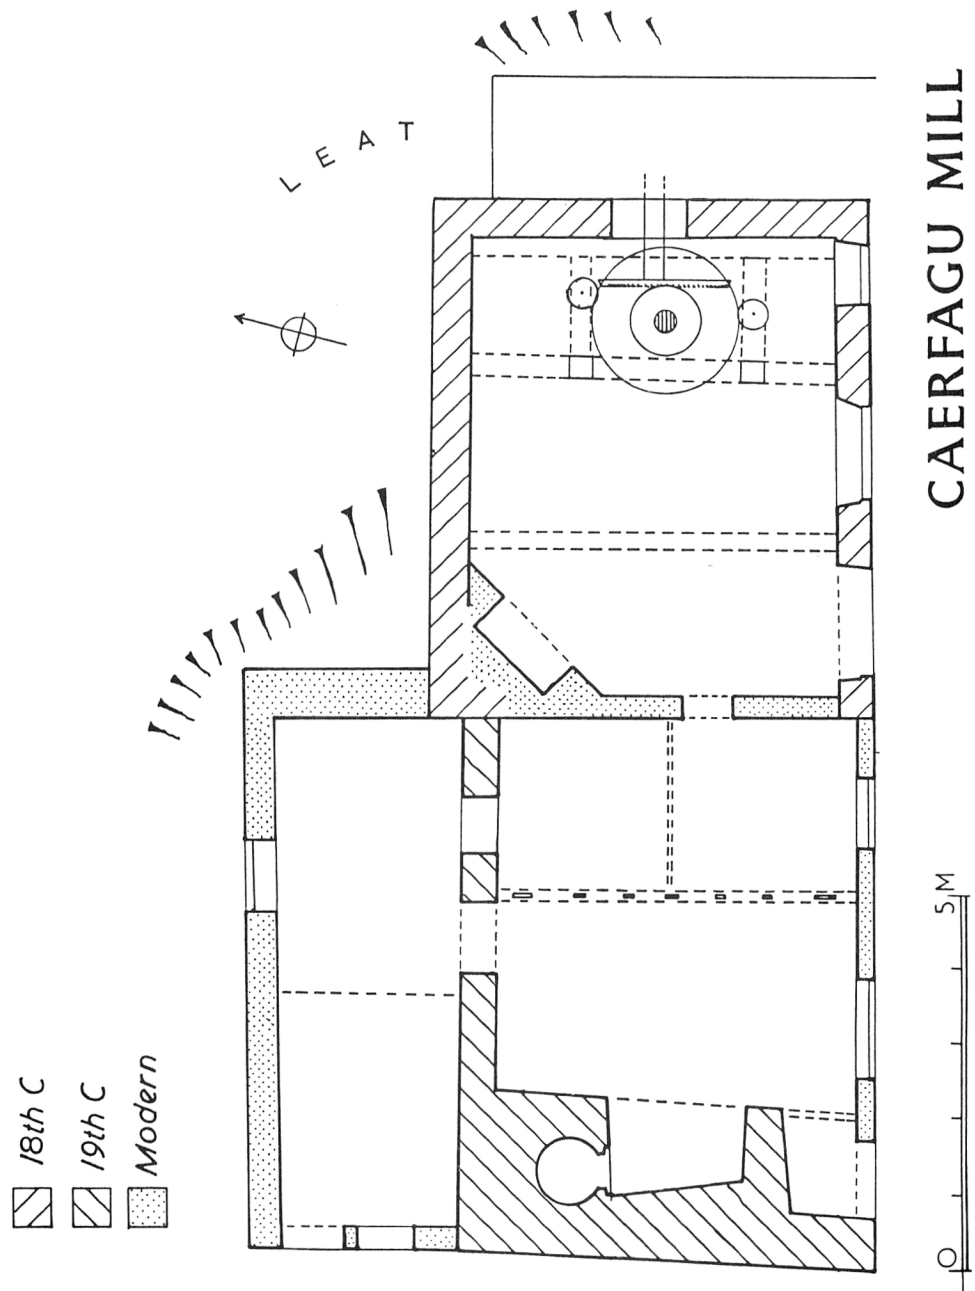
Caerfagu Mill (C/4). Ground floor plan.
